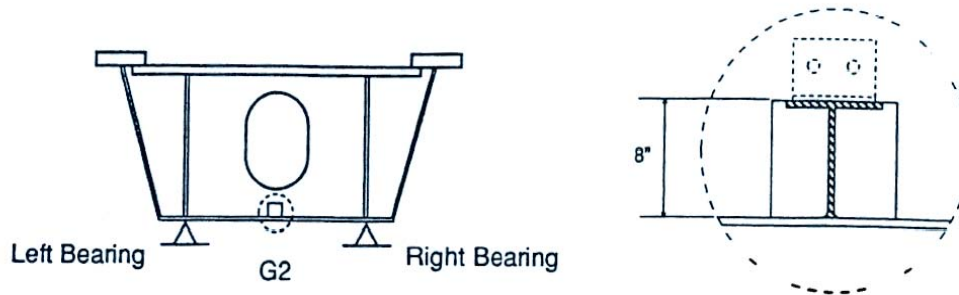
Internal Diaphragm and Bearing Stiffeners at Pier of Girder 2
